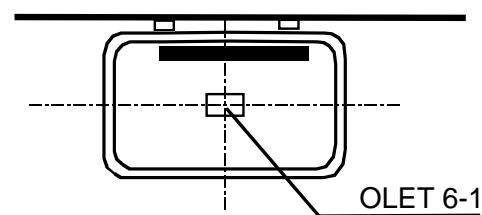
NOTE: Only ceiling installation when using the control panels 1418-2-1517-3 (OT-2-PS-3) and 1418-2-1519 (OT-2-PUi).
